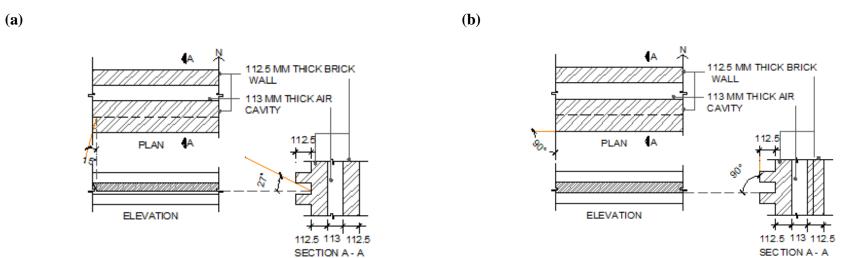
Shaded wall area for one brick course of east wall on 23rd March (a) At 0800/1600 hours (b) At 1200 hours
